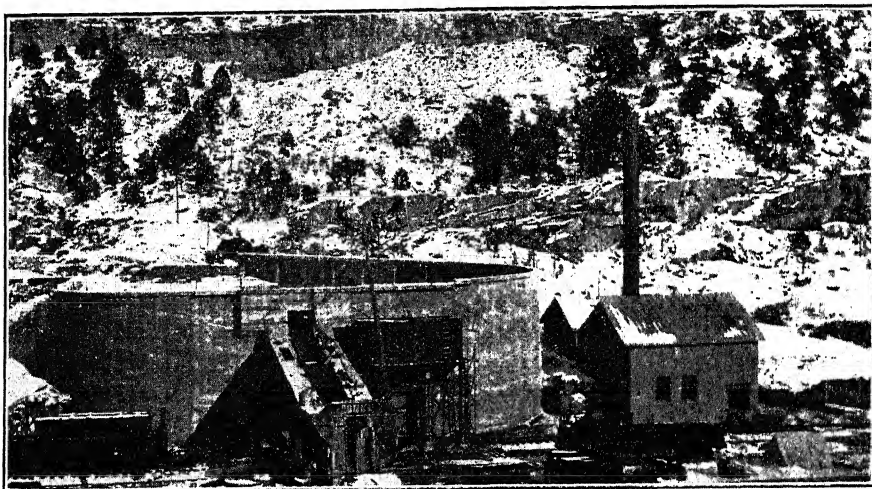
REINFORCED CONCRETE RETAINING WALL AND SHAKING-SCREEN FOUNDATION AT THE MINE OF THE STANDARD COAL CO.
